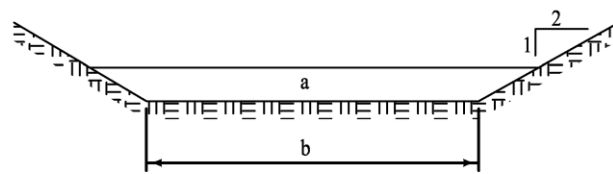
E-12.07: Typical Sediment Basin Emergency Spillway
